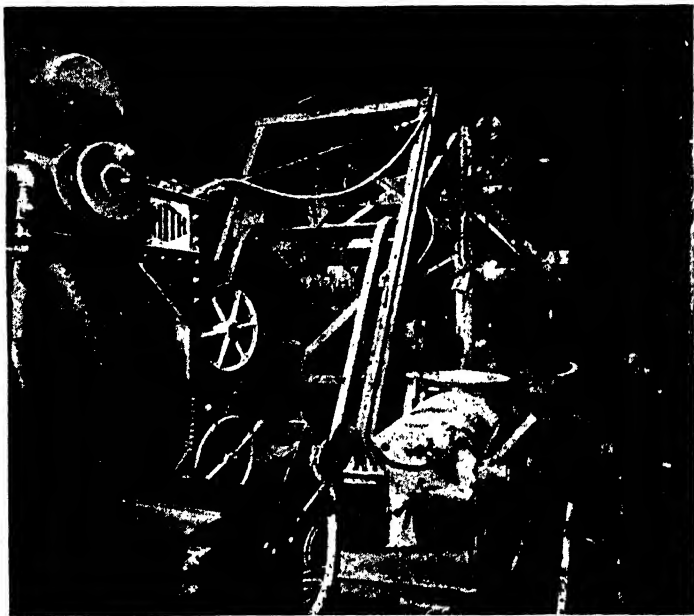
Tunnel mixer and concrete gun, Cascade Tunnel.
